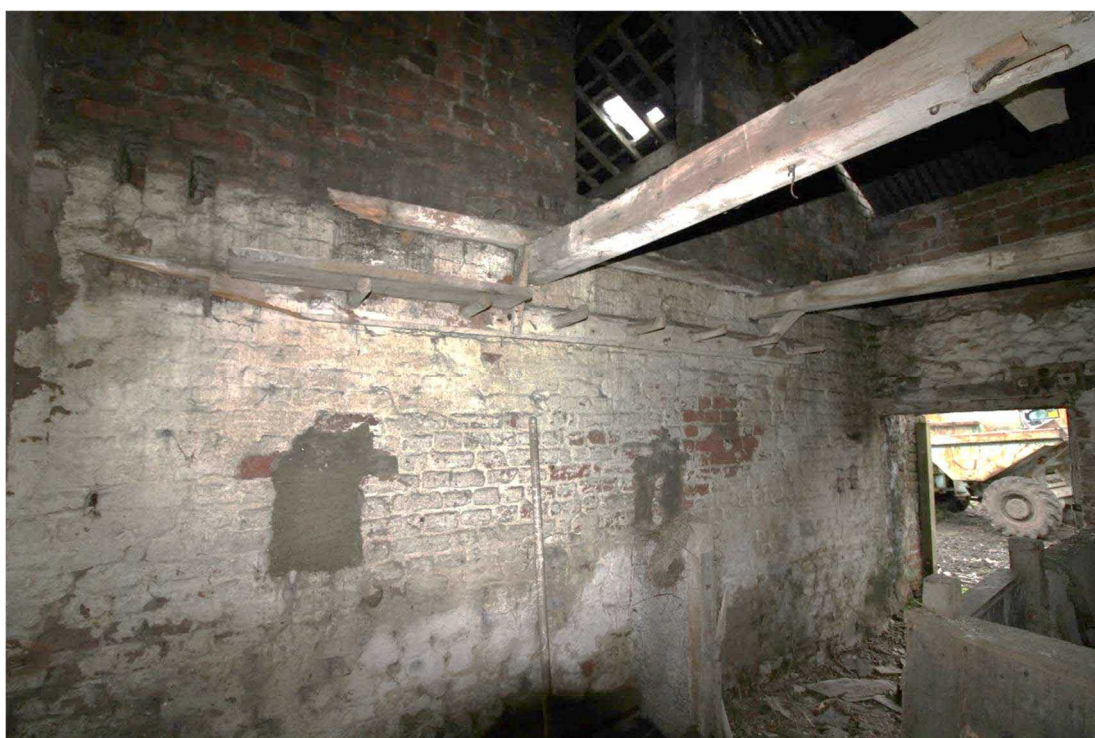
Southern gable of Barn, now enclosed by Southern Extension. Note blocked pairs of ventilation loops and timber peg board at mid height. Facing north-east
